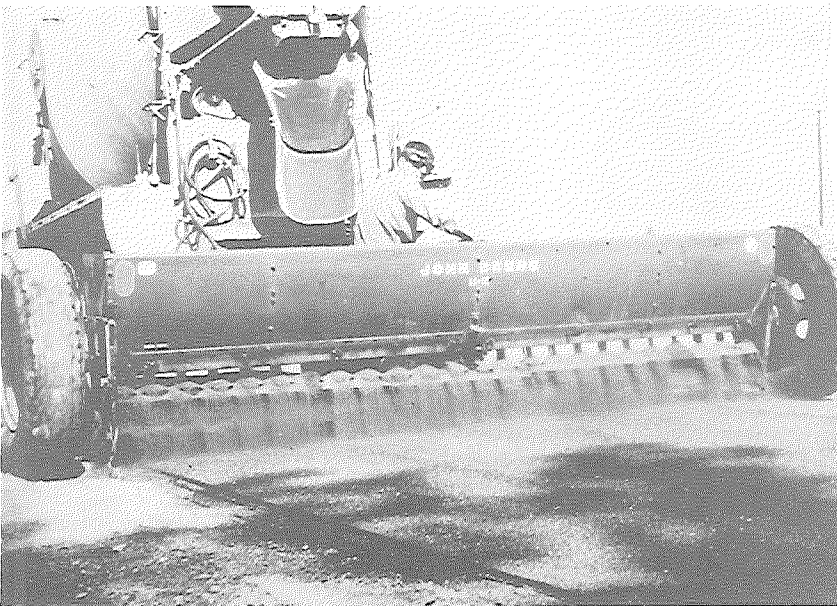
Spreading precoated sand - showing sand being wasted on shoulder.
